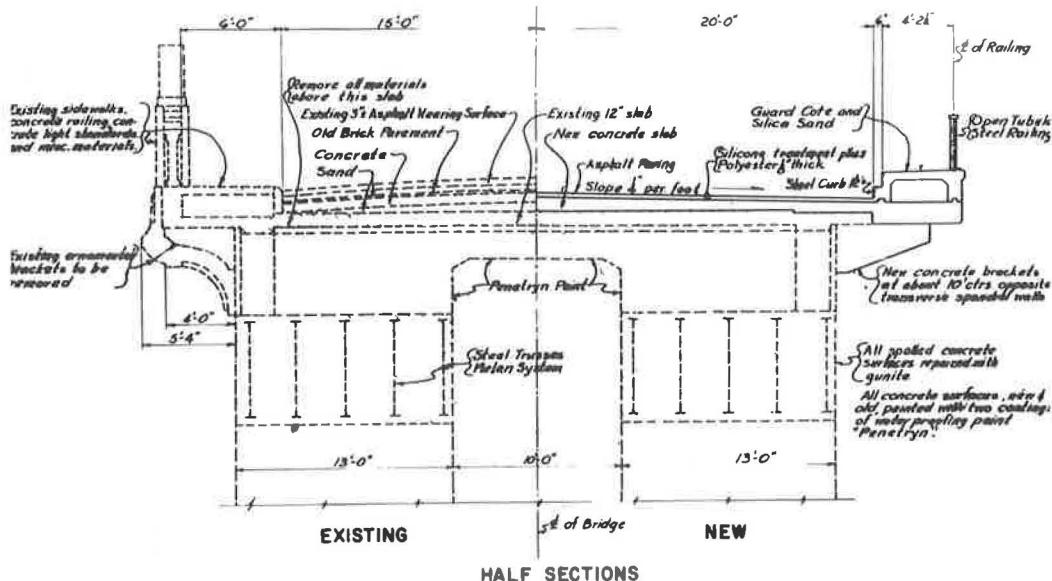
Rehabilitation of Glens Falls Bridge: left half, how bridge was built; right half, how bridge was repaired and widened.
